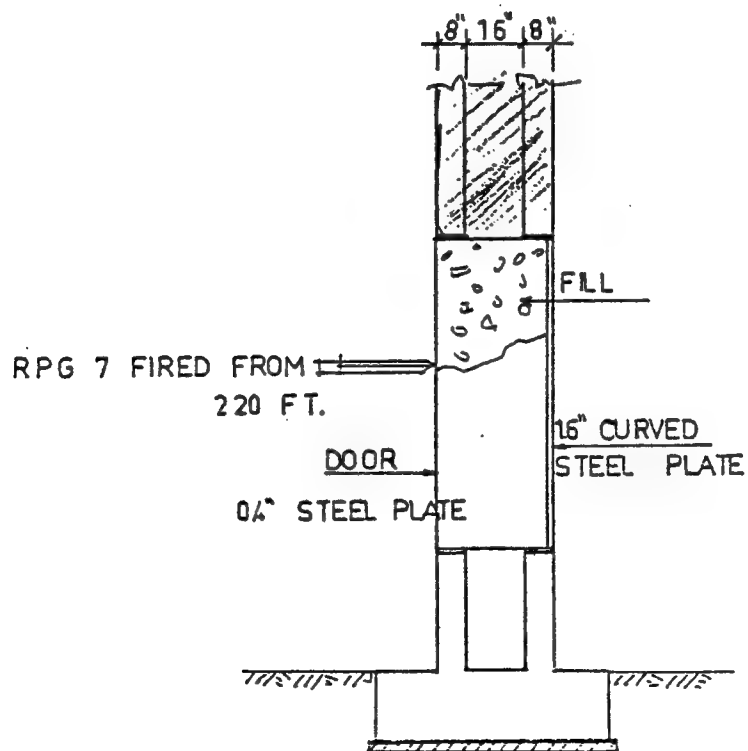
RPG 7 ROCKET FIRED ON PROTECTIVE DOORS
